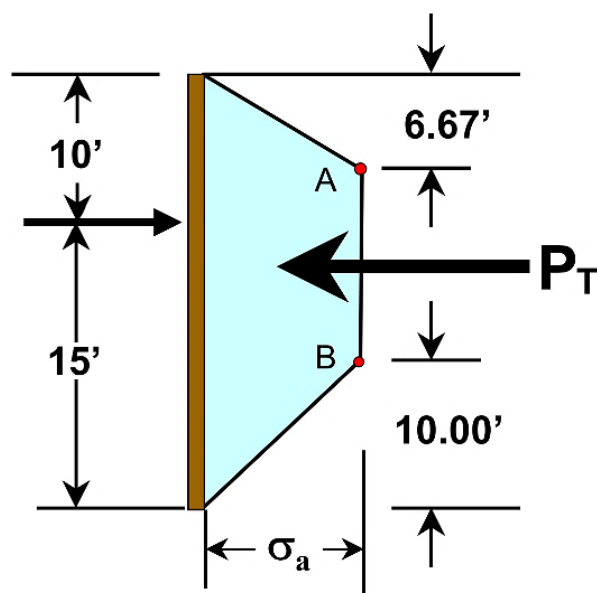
Pressure Diagram for Single Ground Anchor Wall
